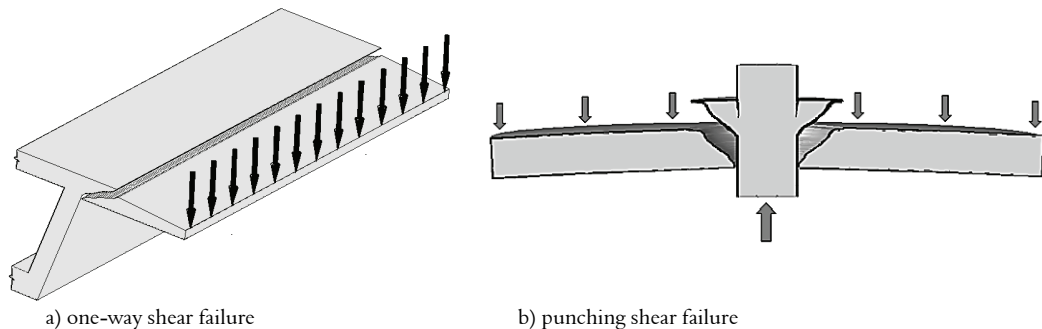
Shear failure of reinforced concrete slabs.
